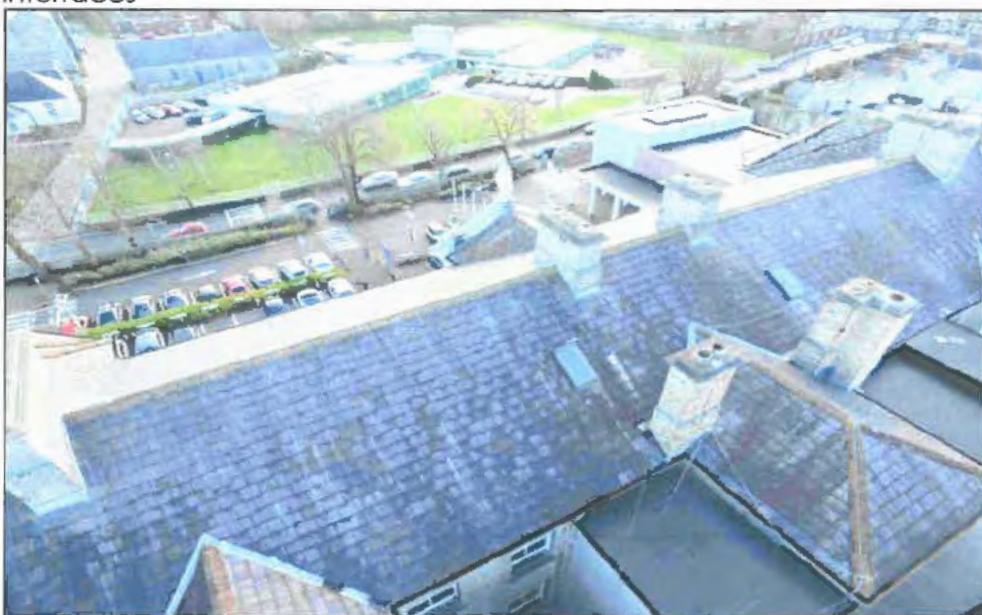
Northwest (rear) elevation of Foundation Building demonstrating intact slate roof structure. Drone footage from applicant.
